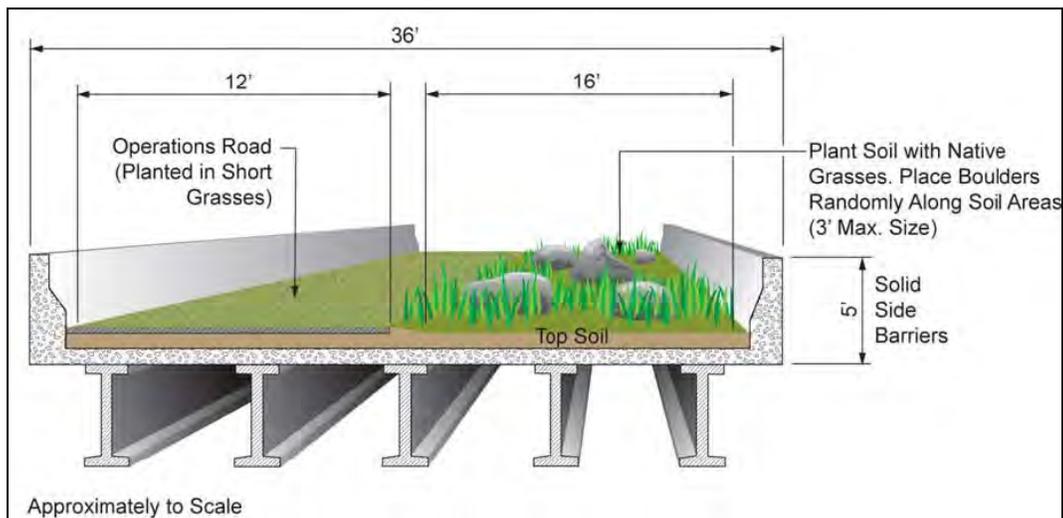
22. Wildlife and O&M bridge typical cross-sections
